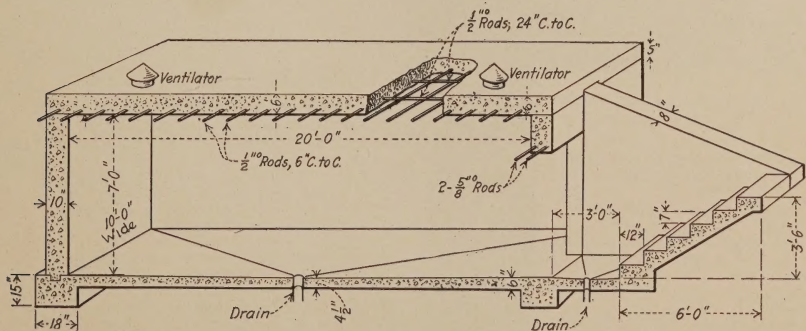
Plan of root cellar with flat reinforced concrete roof. Flat roof is easiest to build, but always must be reinforced.
